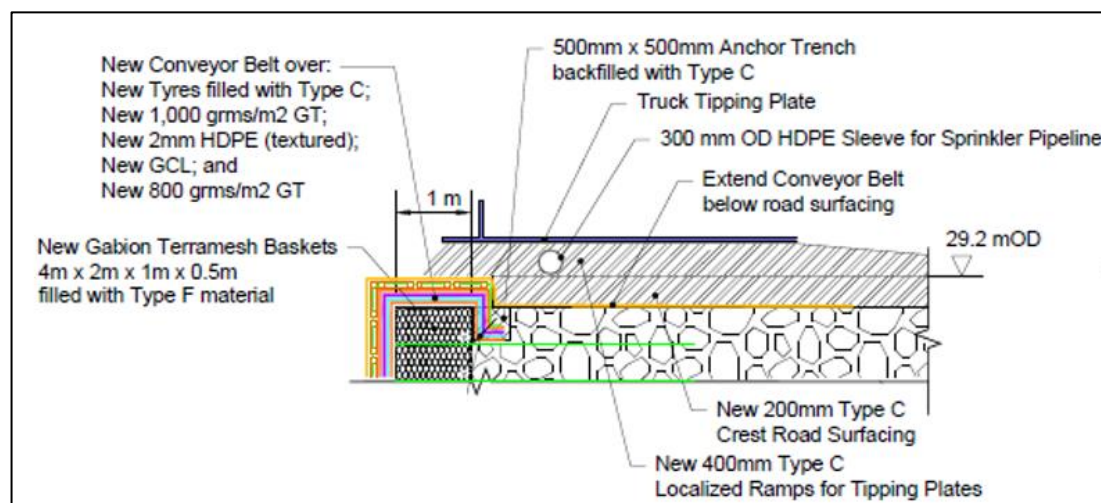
Typical Tipping Plate Section at SCDC (Source: AAL, 2021).
